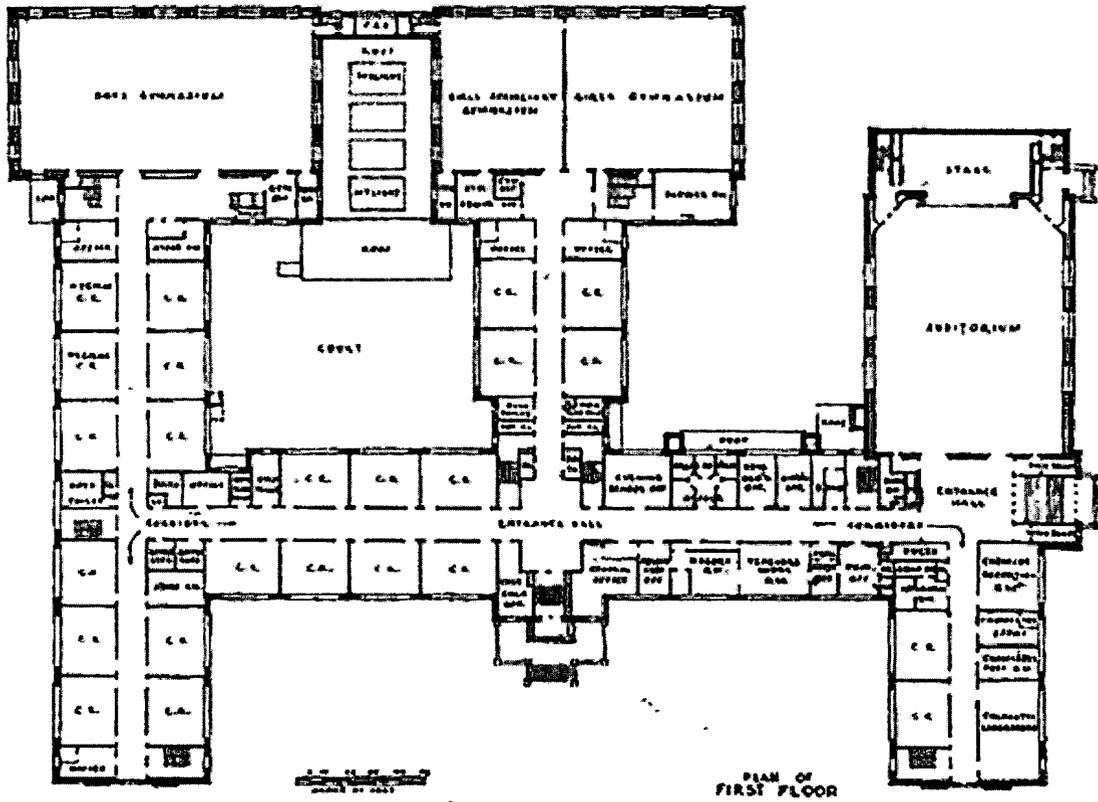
Plan, John Adams High School, showing “conventional planning,” with the gymnasium and auditorium in top left and top right, architect unknown, 1931, New York (Sexton 210).
